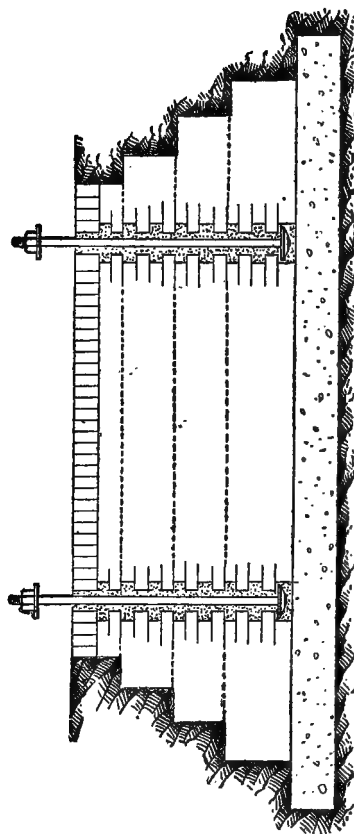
Method of Securing Heavy Engine to Concrete Foundation.
